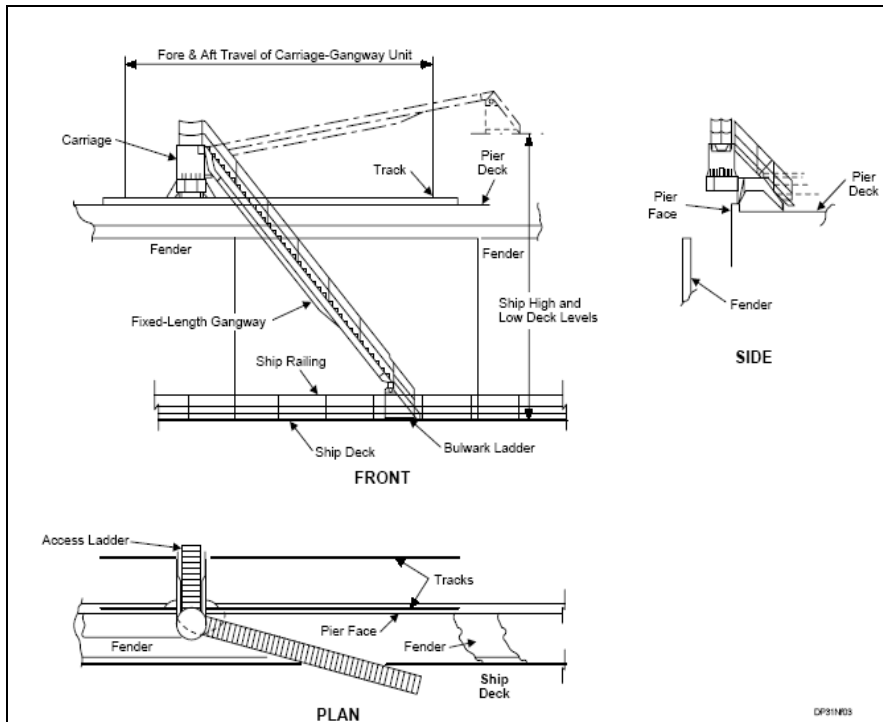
Carriage mounted with track parallel to pier face (mobile system)
